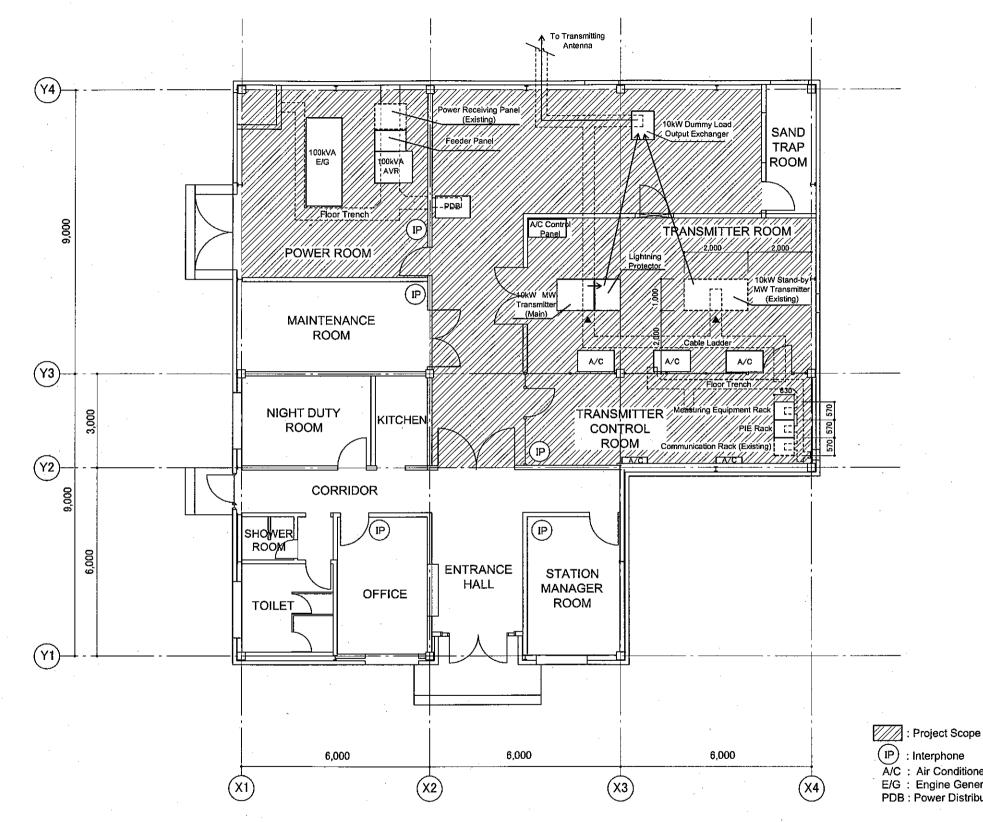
BARDIBAS 10kW MW TRANSMITTING STATION EQUIPMENT LAYOUT
